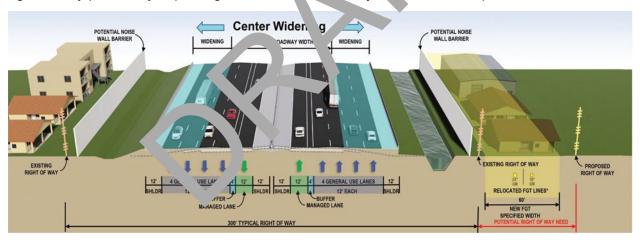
Typical Section Segment 2 - Build Alternative 2 - Center Widening
